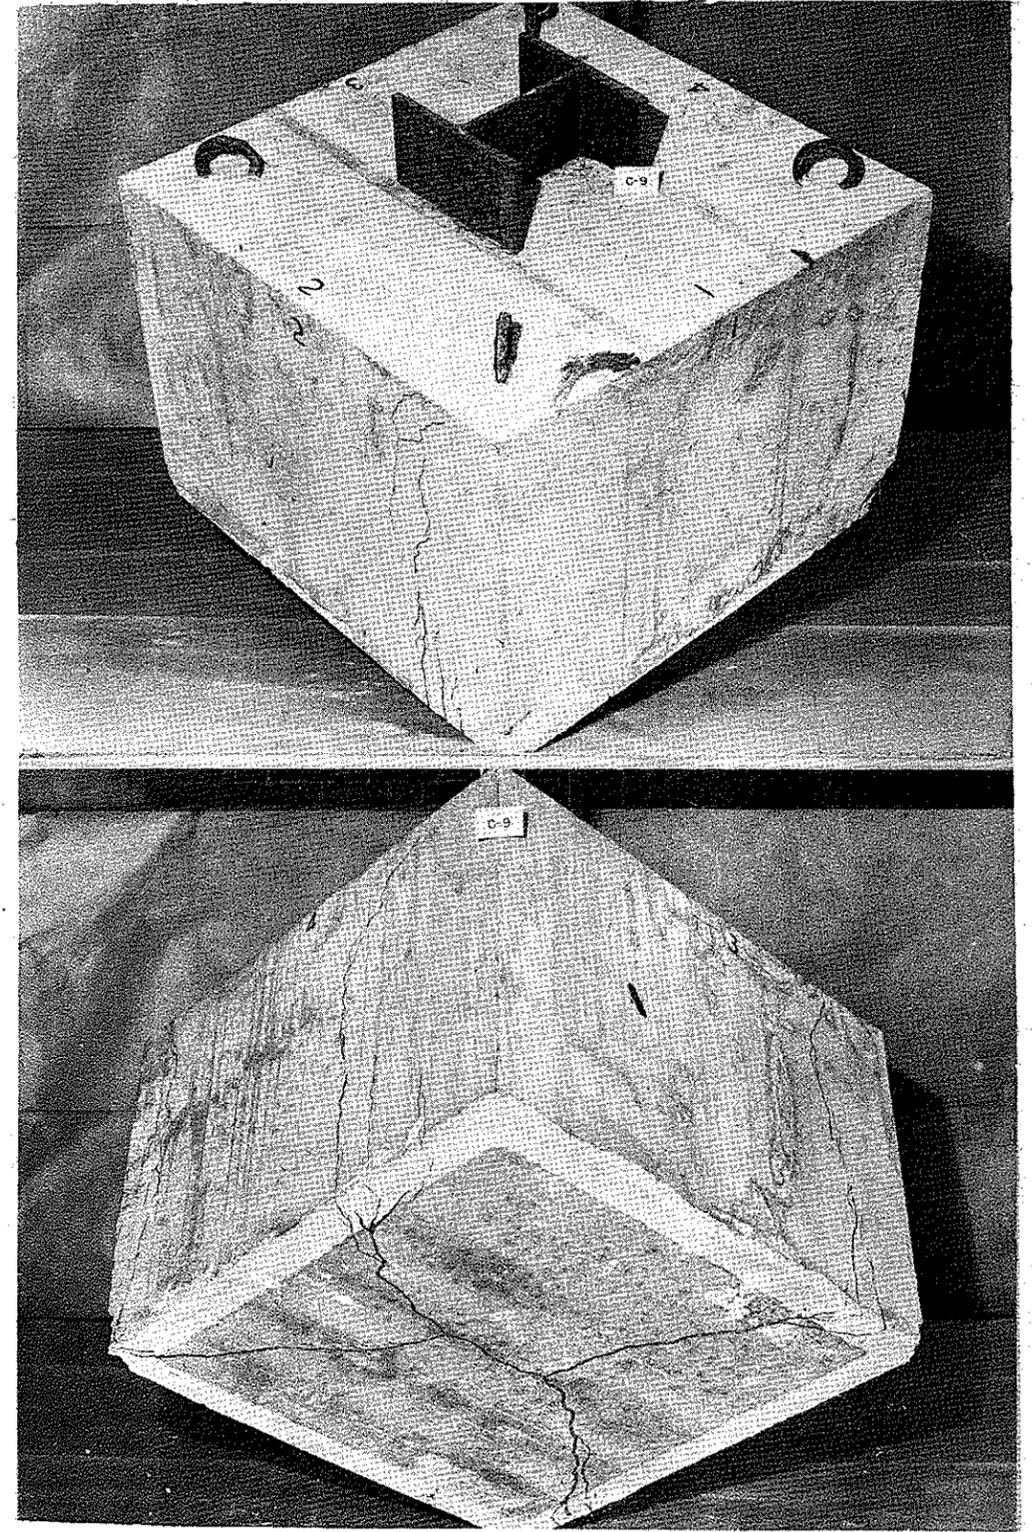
APPEARANCE OF SPECIMEN C-9 AFTER TESTING.
